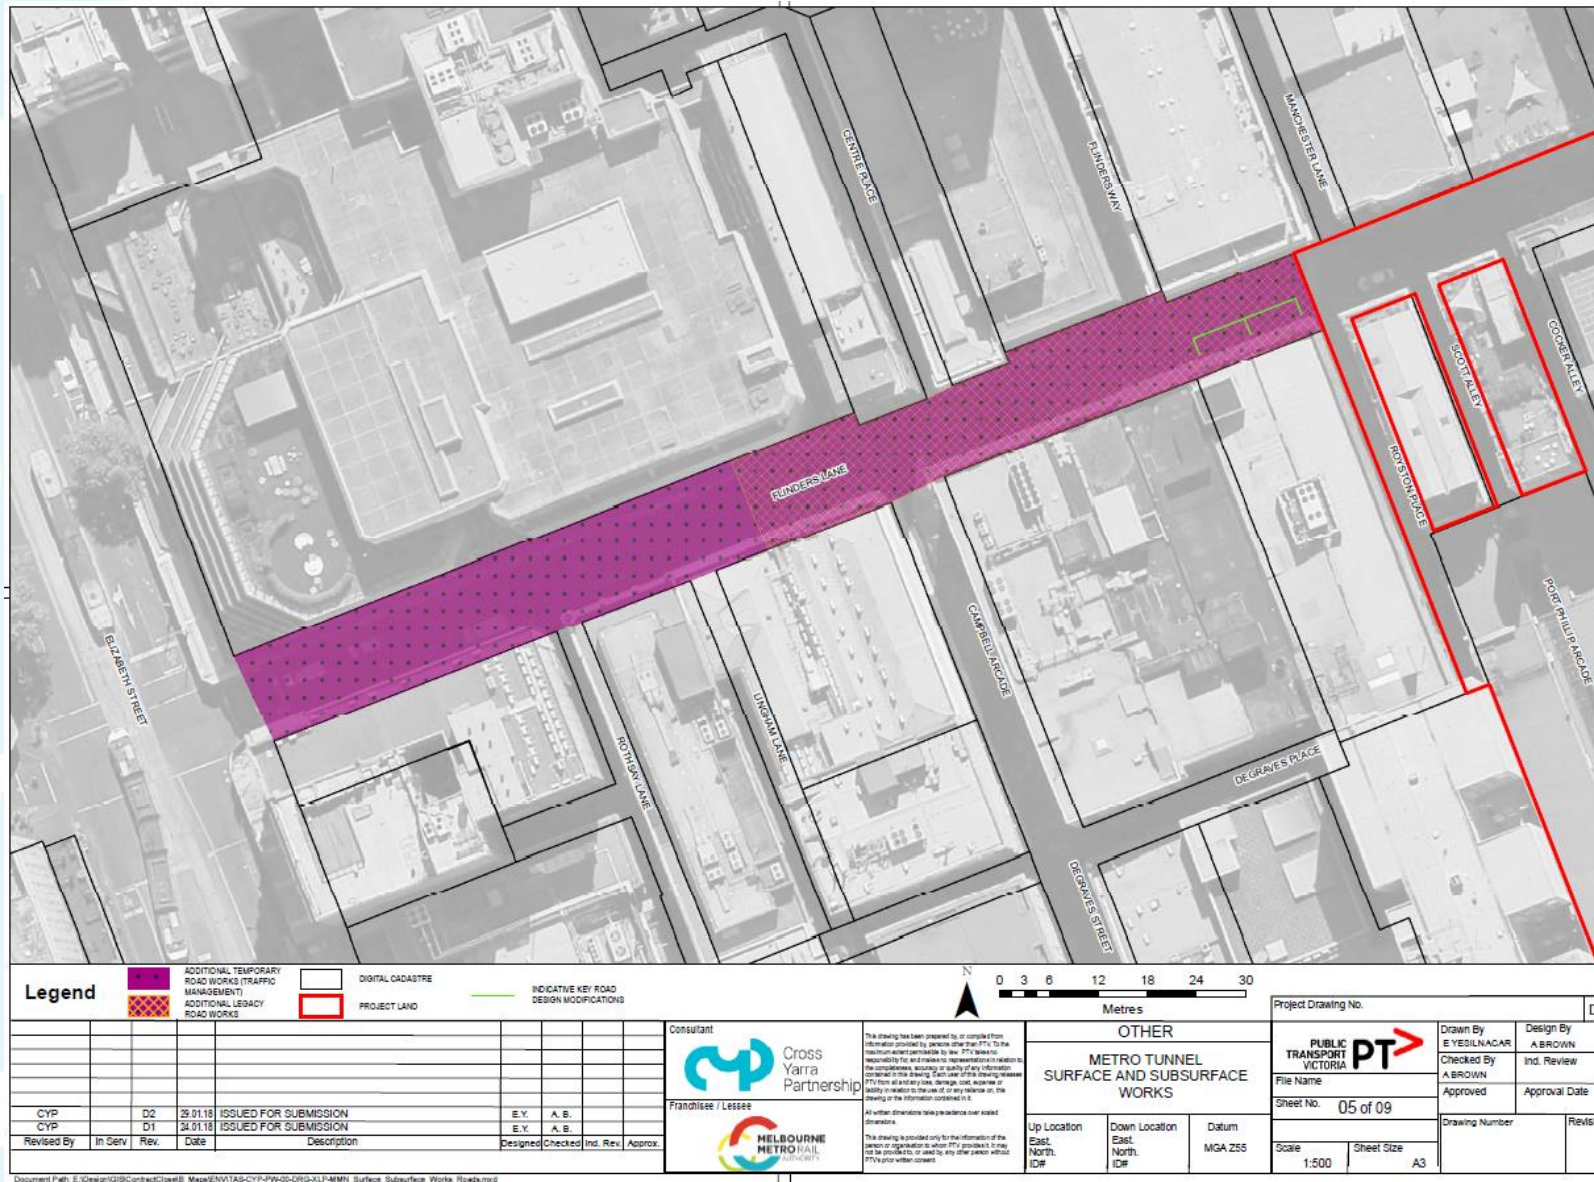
FLINDERS LANE ADDITIONAL ROAD SURFACE WORKS
